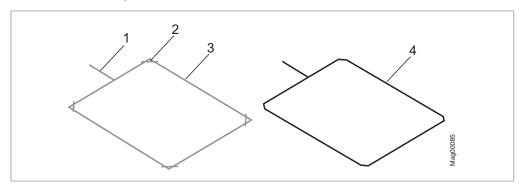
Installing induction loop in bitumen, asphalt, or concrete
